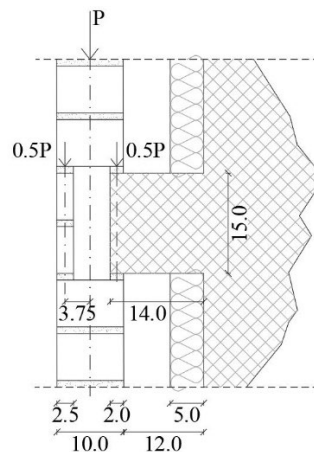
Cross-section of the brick masonry walls at support on RC corbels (dimensions are in cm).
